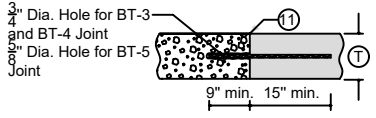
STANDARDROADPLAN PV-101 SHEET 2 OF 8
